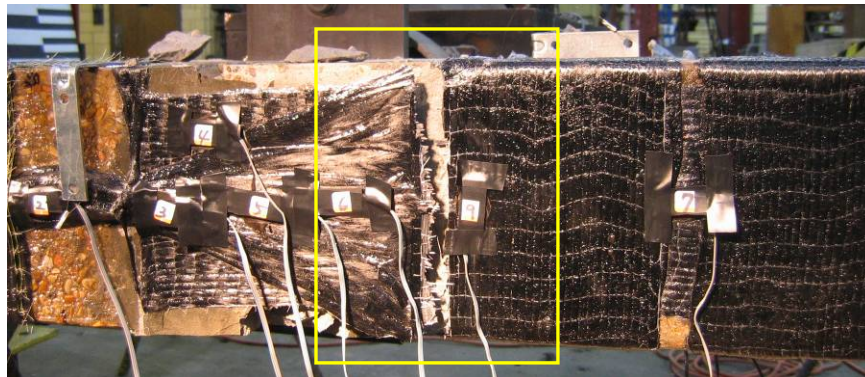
Failure of B-BH-U-6S, fracture of beam sheet
